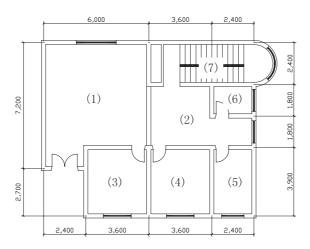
Plane figure of the house: (1) sitting room, (2) dining room, (3) bedroom 1, (4) bedroom 2, (5) kitchen, (6) washing room.
